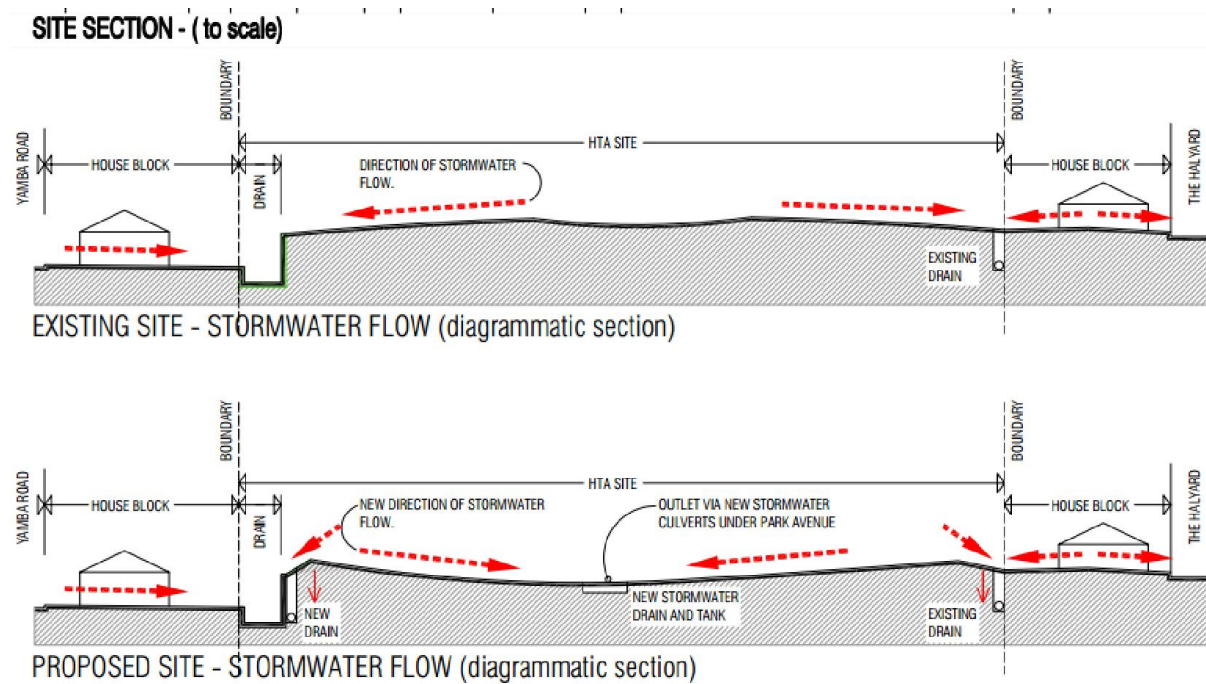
Proposed Stormwater Flow Path Plan by JKH Build Design Drawing No. DA-21
